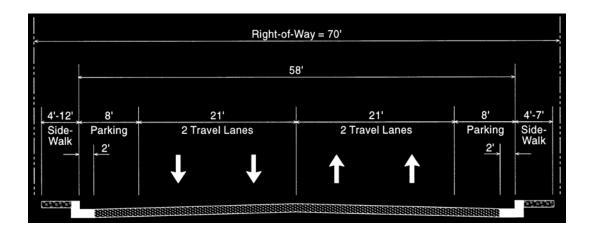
Existing Typical Jefferson Street Cross-Section
